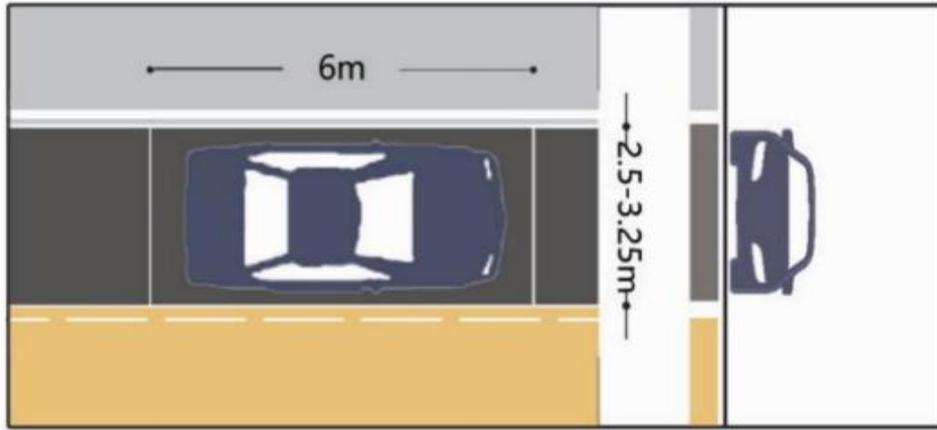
Dimensions of in-street parking strips(Source:Google)
